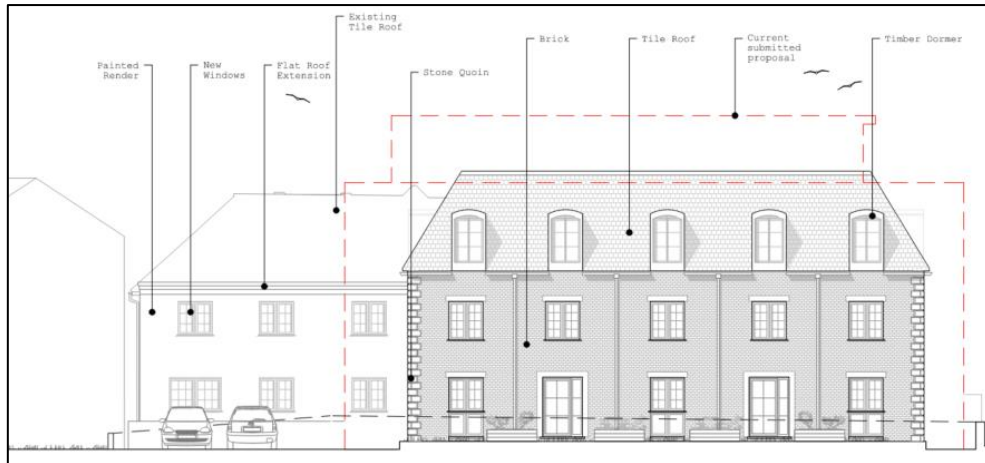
Proposed extension frontage elevation (original scheme shown dotted)
